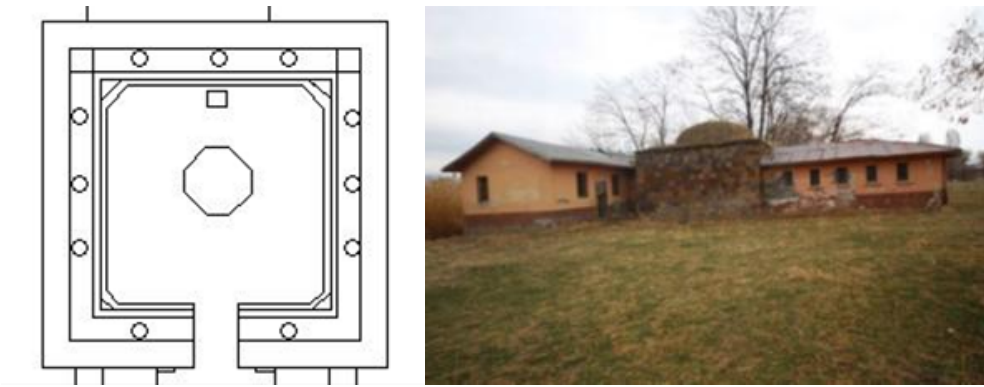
Van Ernis Village Institute Bath Hot Section Plan and View
